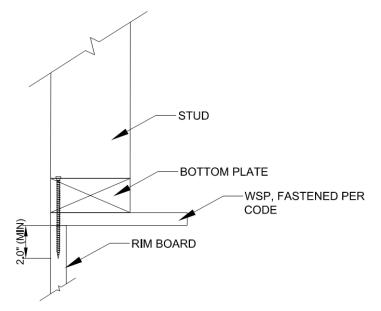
Fastener in Bottom Plate to Rim Board Connection
